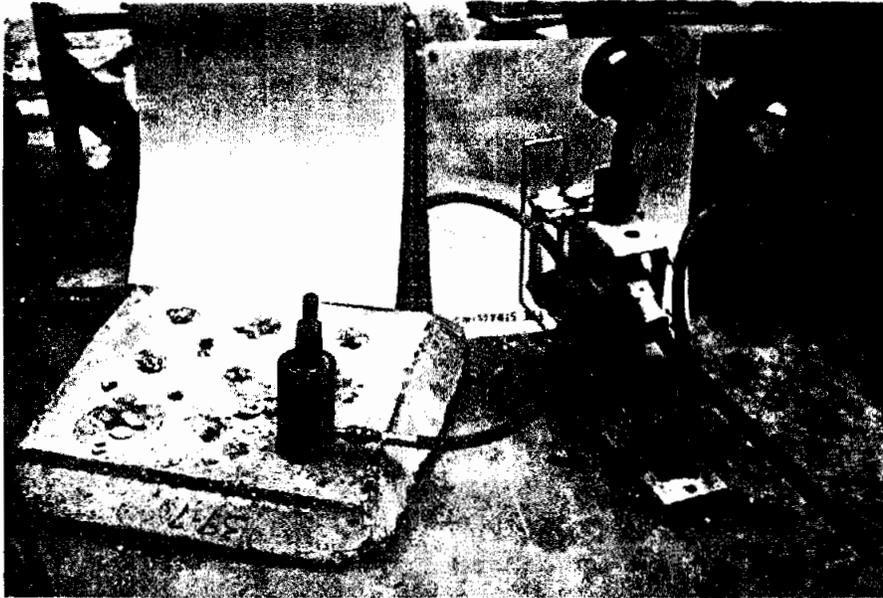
PULL-OUT TEST EQUIPMENT
